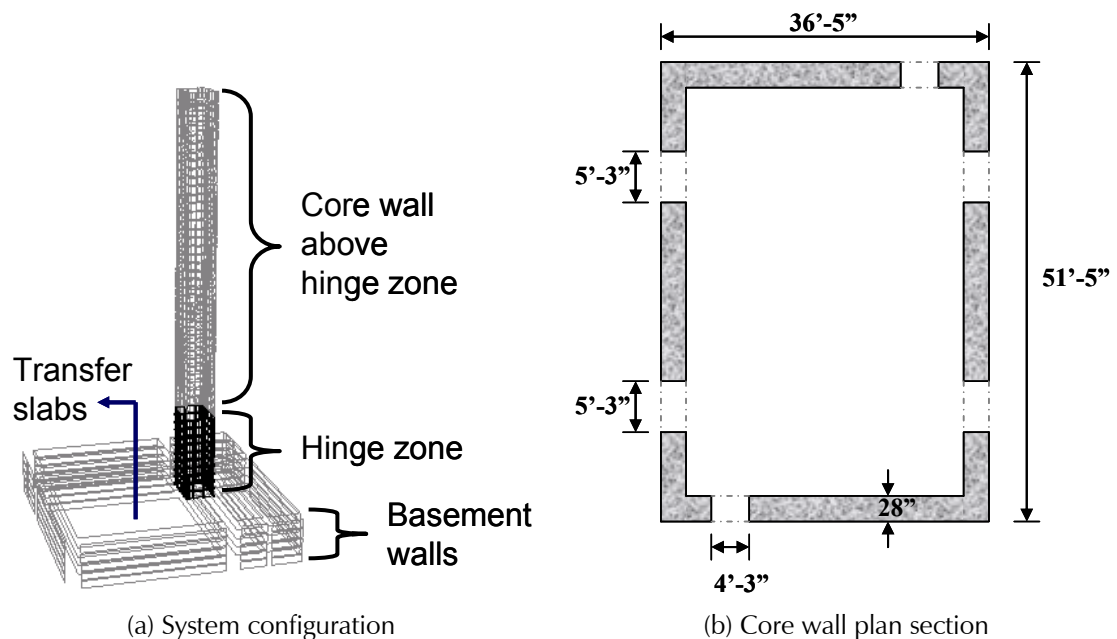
Configuration and plan section of tall core wall building system used in parametric studies.
